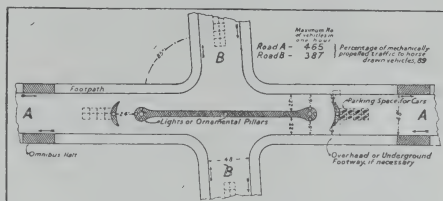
General plan of proposed arrangement at cross-roads to overcome traffic congestion. In this case two 48 ft. roads with 12 ft. footpaths intersect at 85 degrees.
